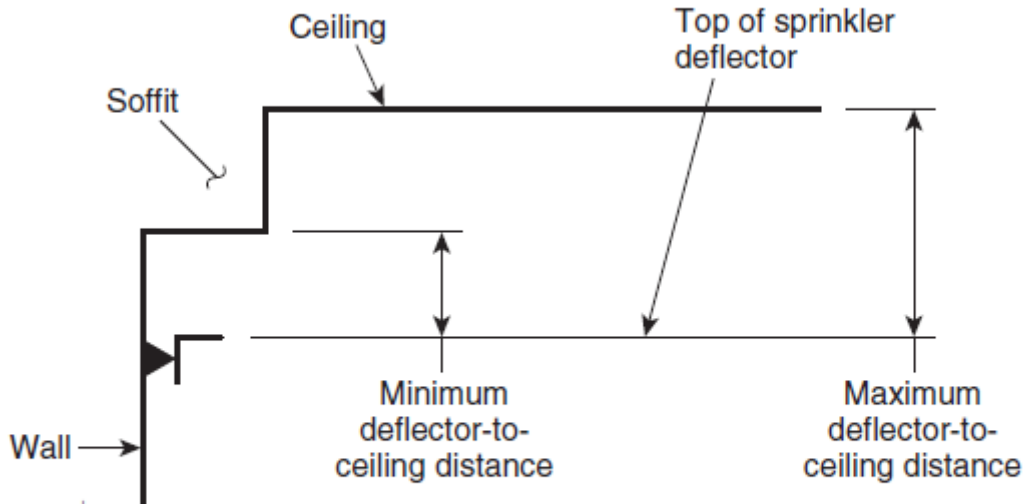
Location Sidewalls with Respect to Soffits — Sidewall Under Soffit.
